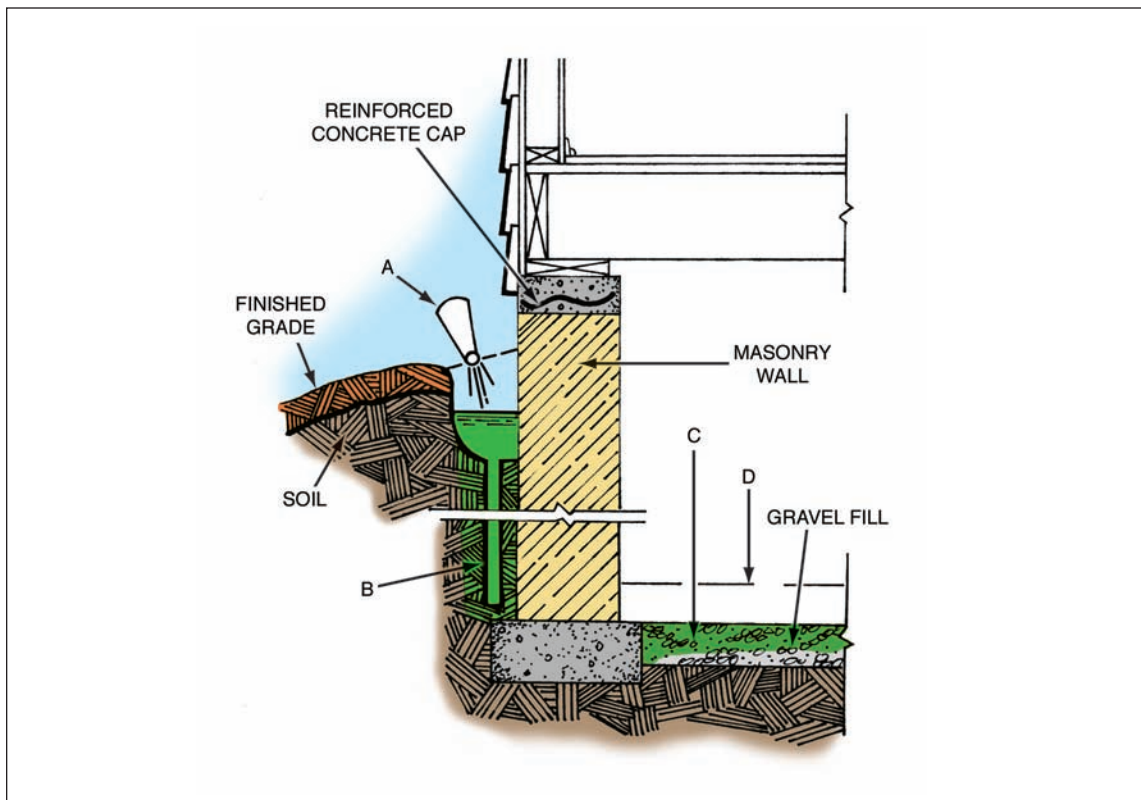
Application of chemical in basement construction: (A) treatment along foundation, (B) rodding to top of footing, (C) treatment of fill below slab, and (D) slab poured after fill has been treated.
